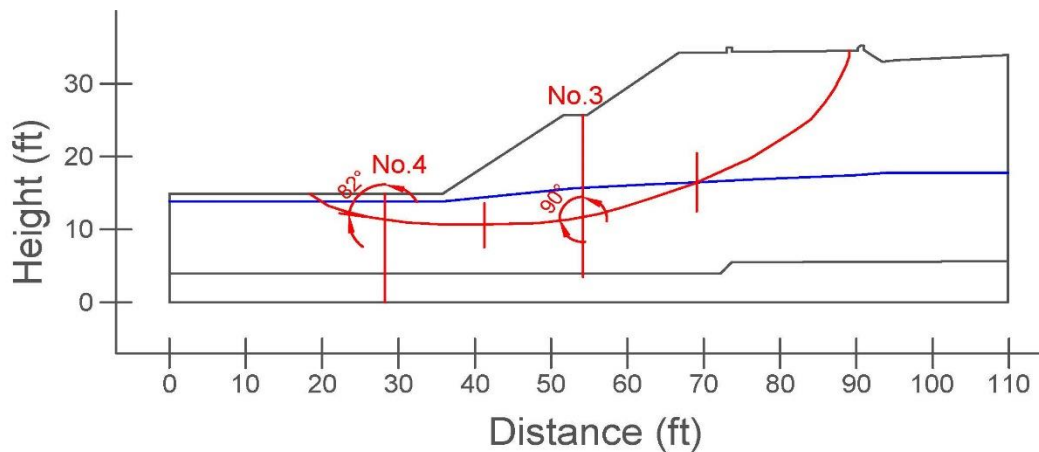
Sub-sectioning of the cross-section and failure plane for Chonan Middle School Embankment
